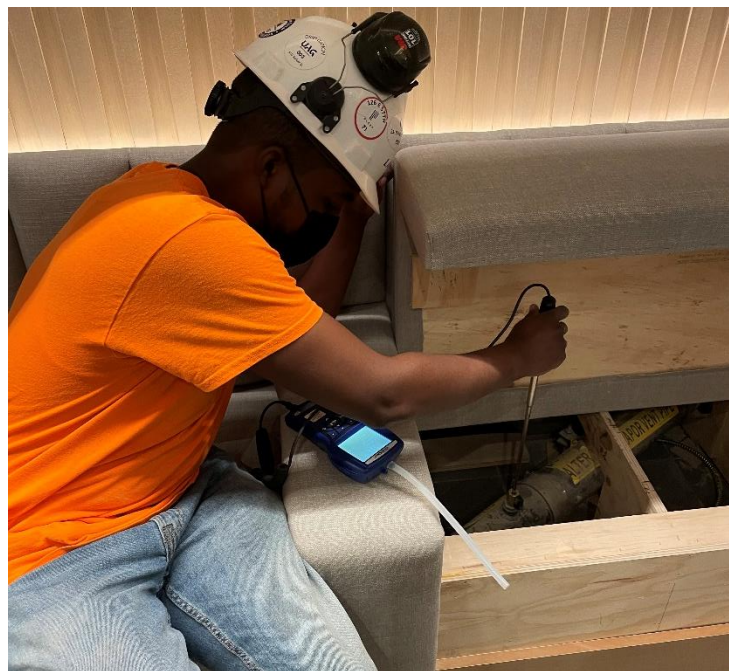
, 04/25/2023: View of Langan collecting flow rate readings from the eastern first floor-level riser pipe connection (facing east)
